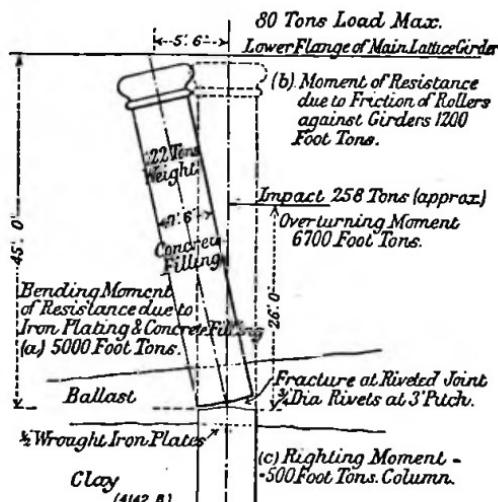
Stresses on Column of Wandsworth Bridge.
